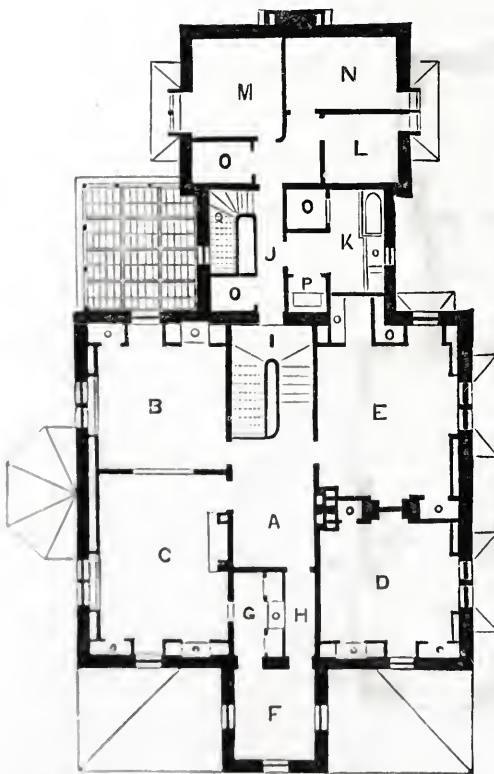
shows the arrangement of the Chamber floor, or second story. A, the Hall. B, C, D, and E, Chambers. F, Boudoir. G, Closet. H, Passage to Boudoir. I, Half landing connected
